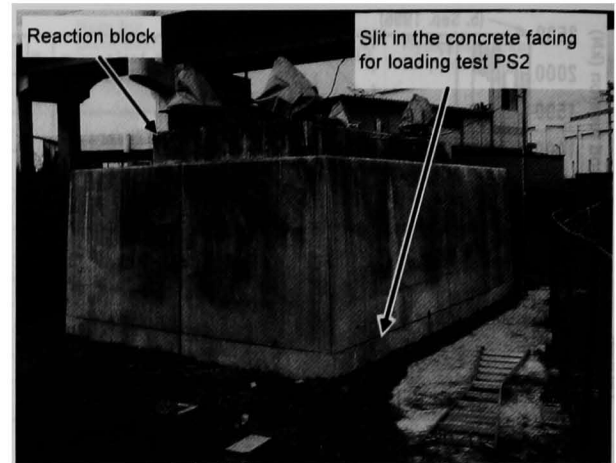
Full-scale vertical loading test PS1 and PS2 of the pier
